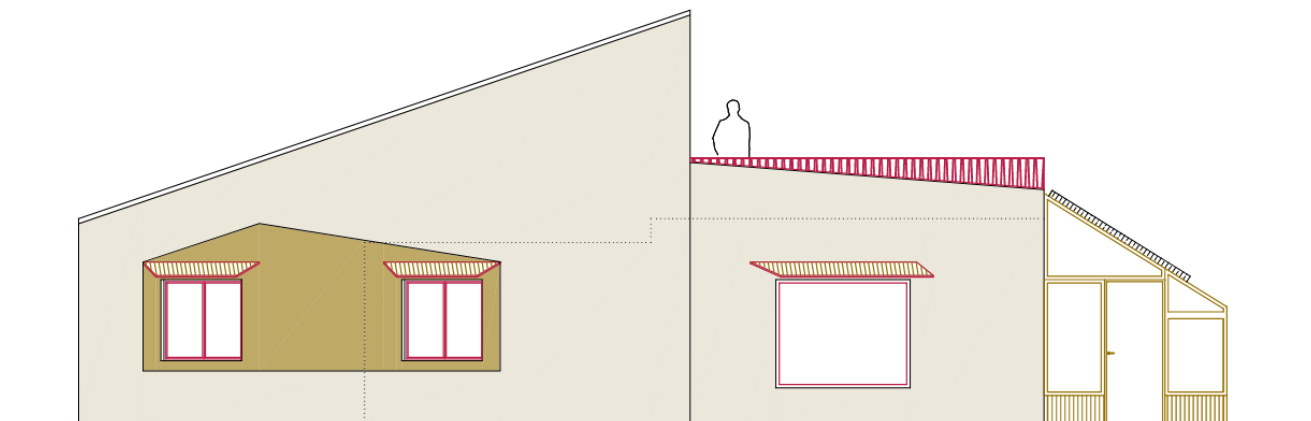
South elevations of Scenario 0, Brick and Concrete house in Getafe.
